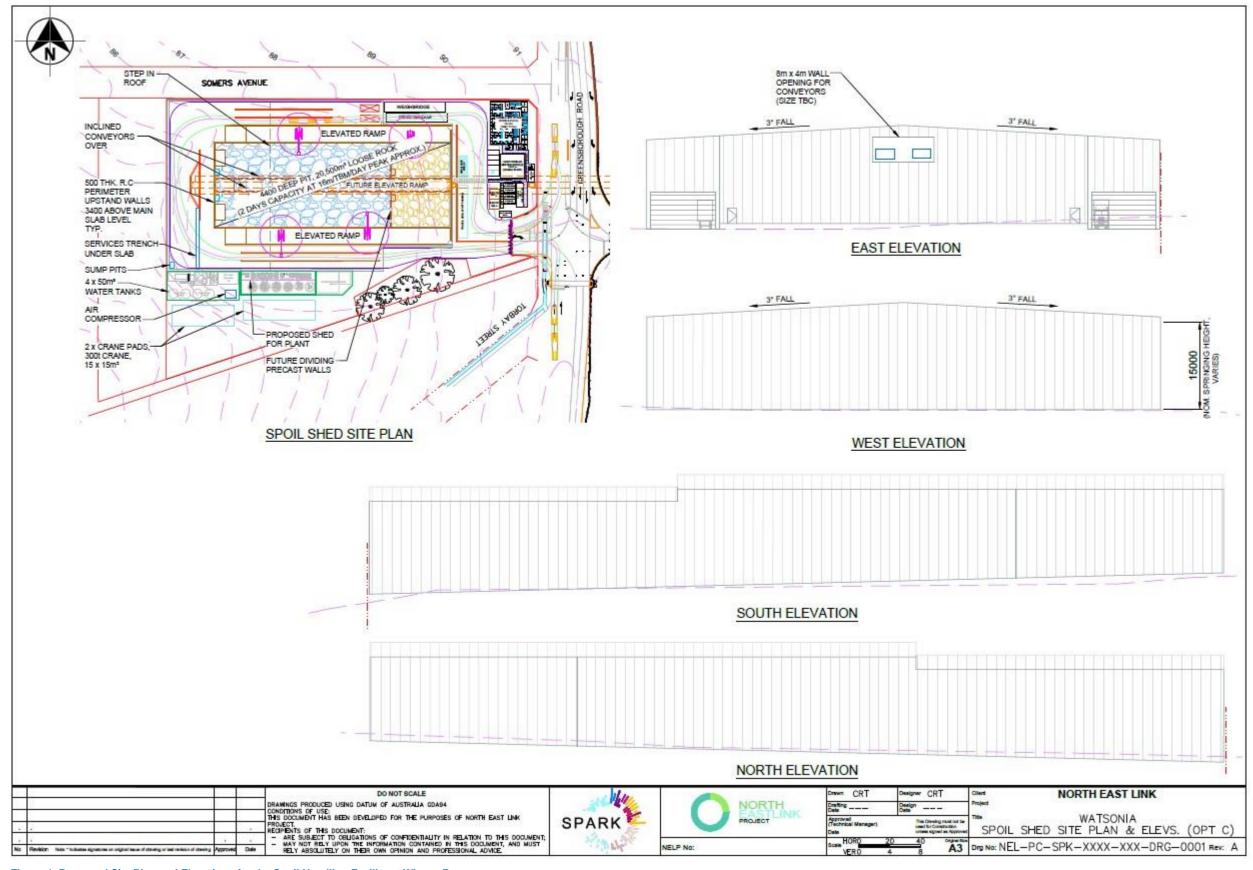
Proposed Site Plan and Elevations for the Spoil Handling Facility at Winsor Reserve
